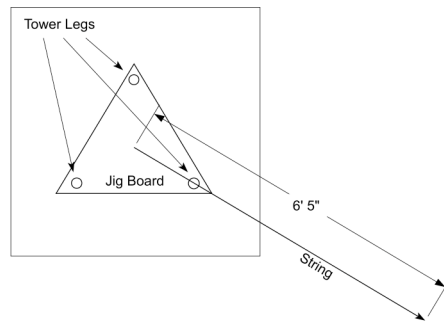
Diagram of a jig used to mark guy wire anchor positions for a 7-foot tower section.
